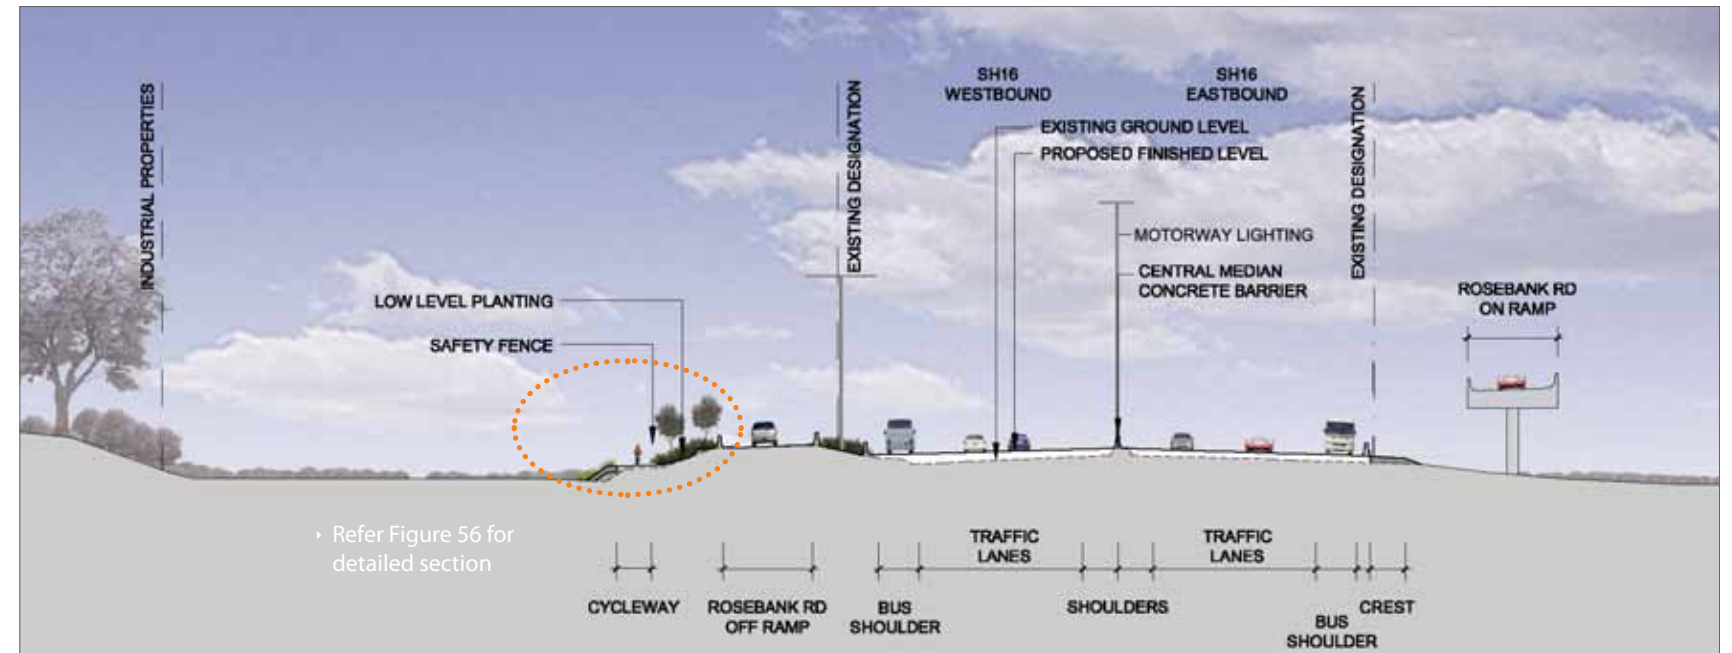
Future cross-section at Rosebank off-ramp (section C)
